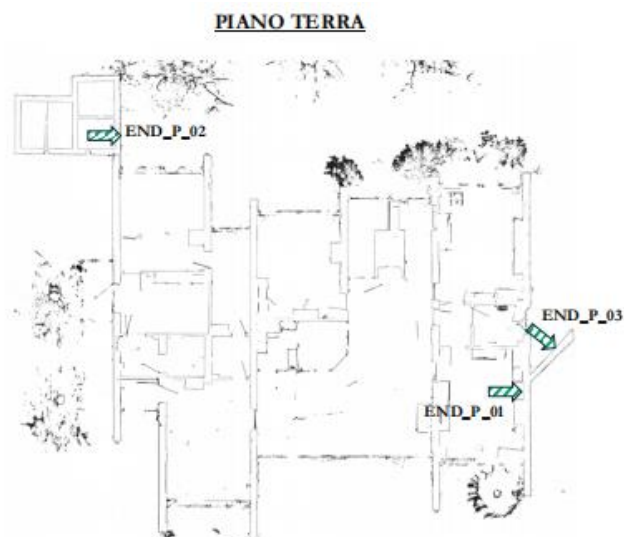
Location of investigated walls in the underground floor (END\_P\_01, END\_P\_02, END\_P\_03)
